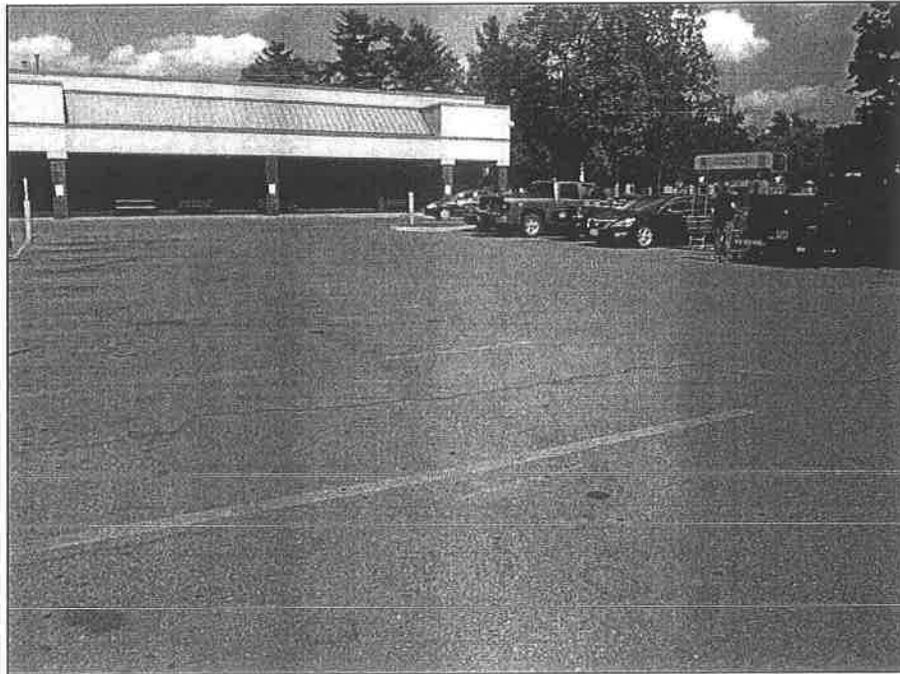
Proposed Hannaford To Go location and store from the west
